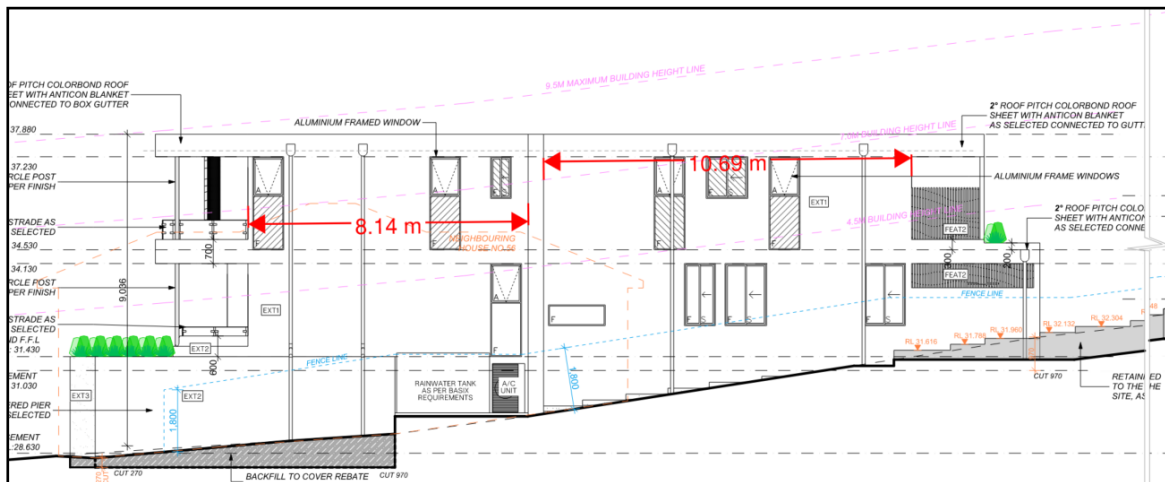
Eastern Side Elevation - 54 Daunt Avenue - Demonstrating the recess and modules of less than 12m (Source: Prime Design)
